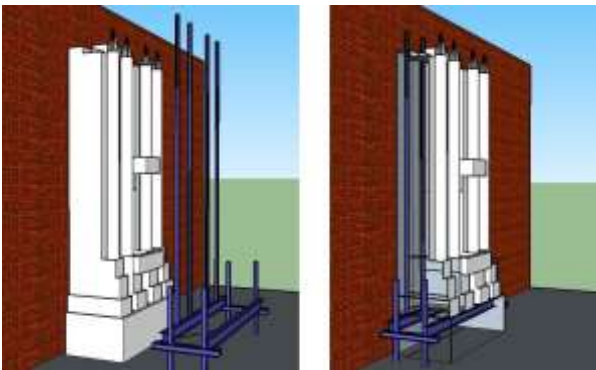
The temporary steelwork structure shown assembled both outside and inside the Opera Box
